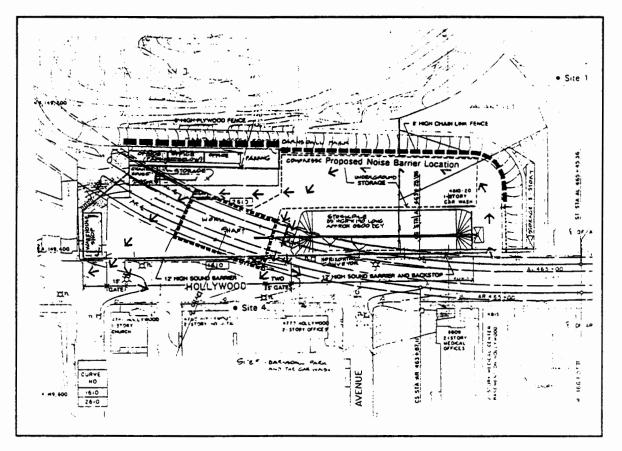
NOISE BARRIER LOCATION AT SOUTH SIDE OF CONSTRUCTION SITE
